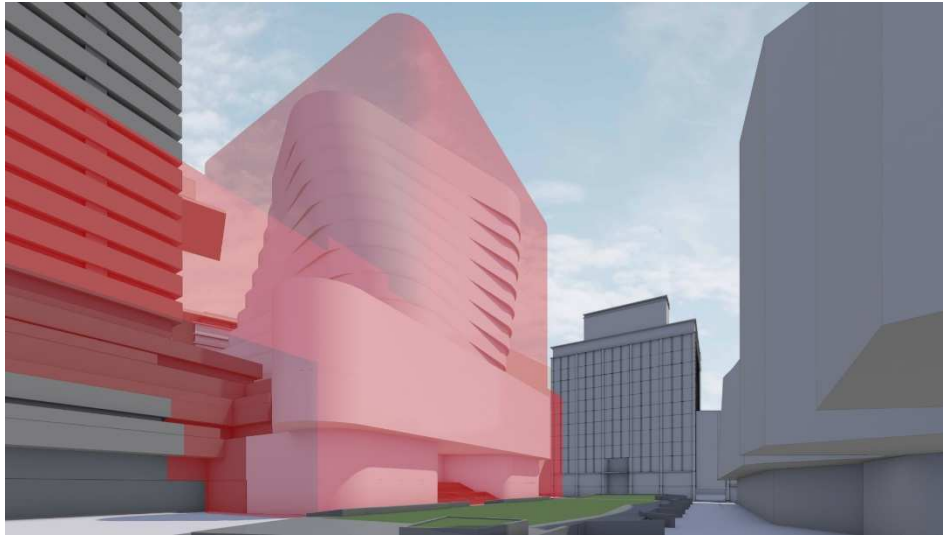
Approved building envelope framing CB02 Tower as seen from Alumni Green
